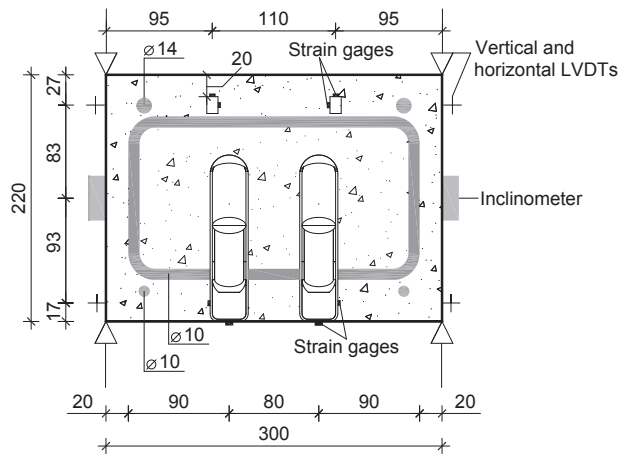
Cross section of experimental beam with one thermal break unit, concrete reinforcement and instrumentation, dimensions in (mm).
